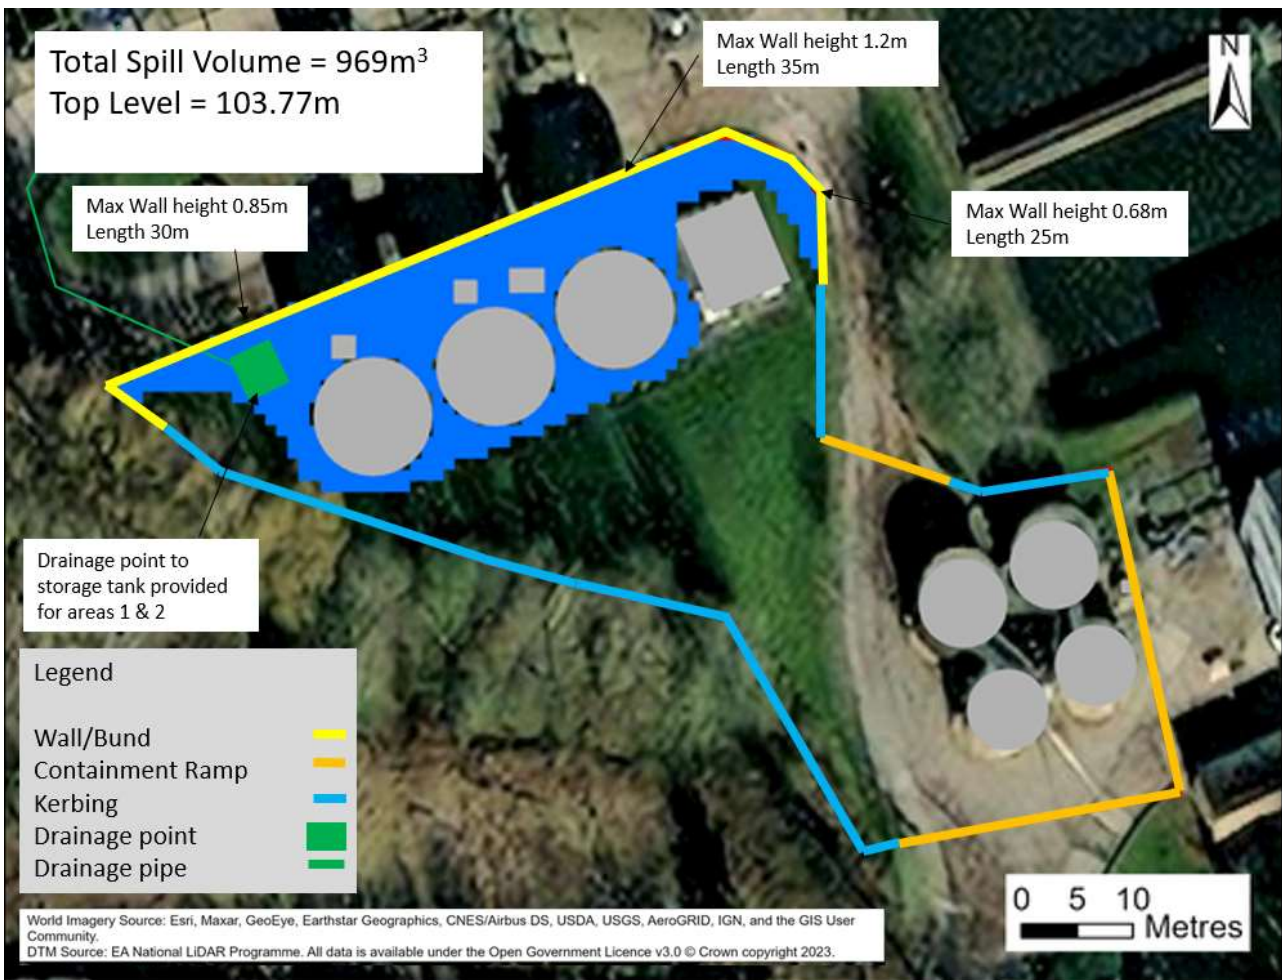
recommended modifications to provide remote secondary containment for scenario 3
